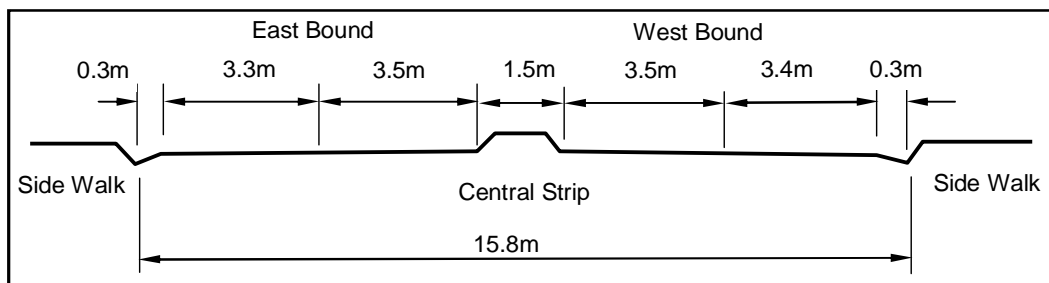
Typical Road Section of Mendana Avenue
